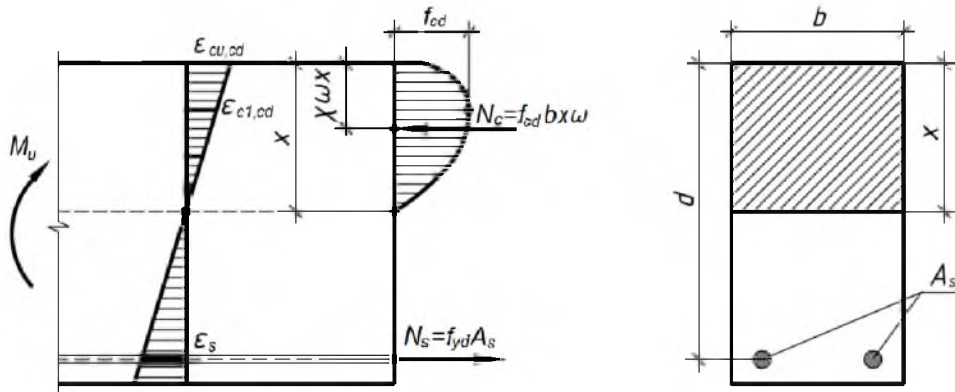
The design scheme of the reinforced concrete element in the normal section: distribution of forces, stresses and strains
